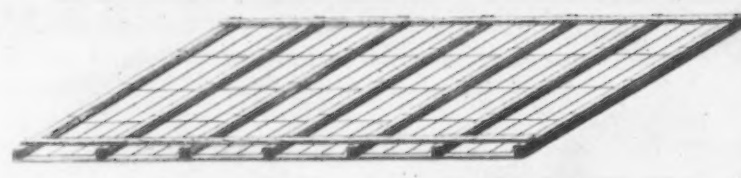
Applying precast gypsum slabs on the steel framed roof of the post office at Easthampton—a small building of residential type of construction.
